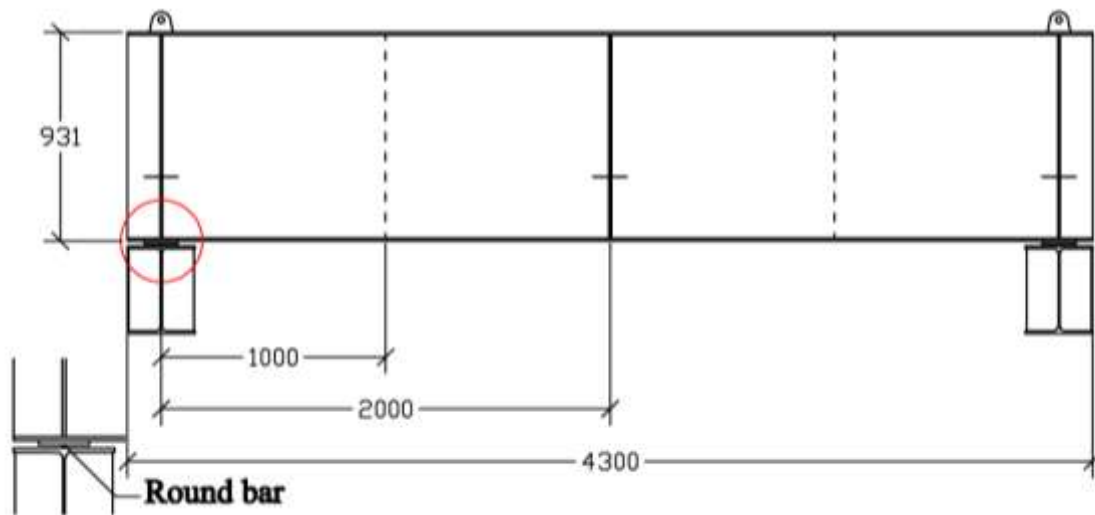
Supports of orthotropic steel bridge deck (without asphalt surfacing) (mm)
